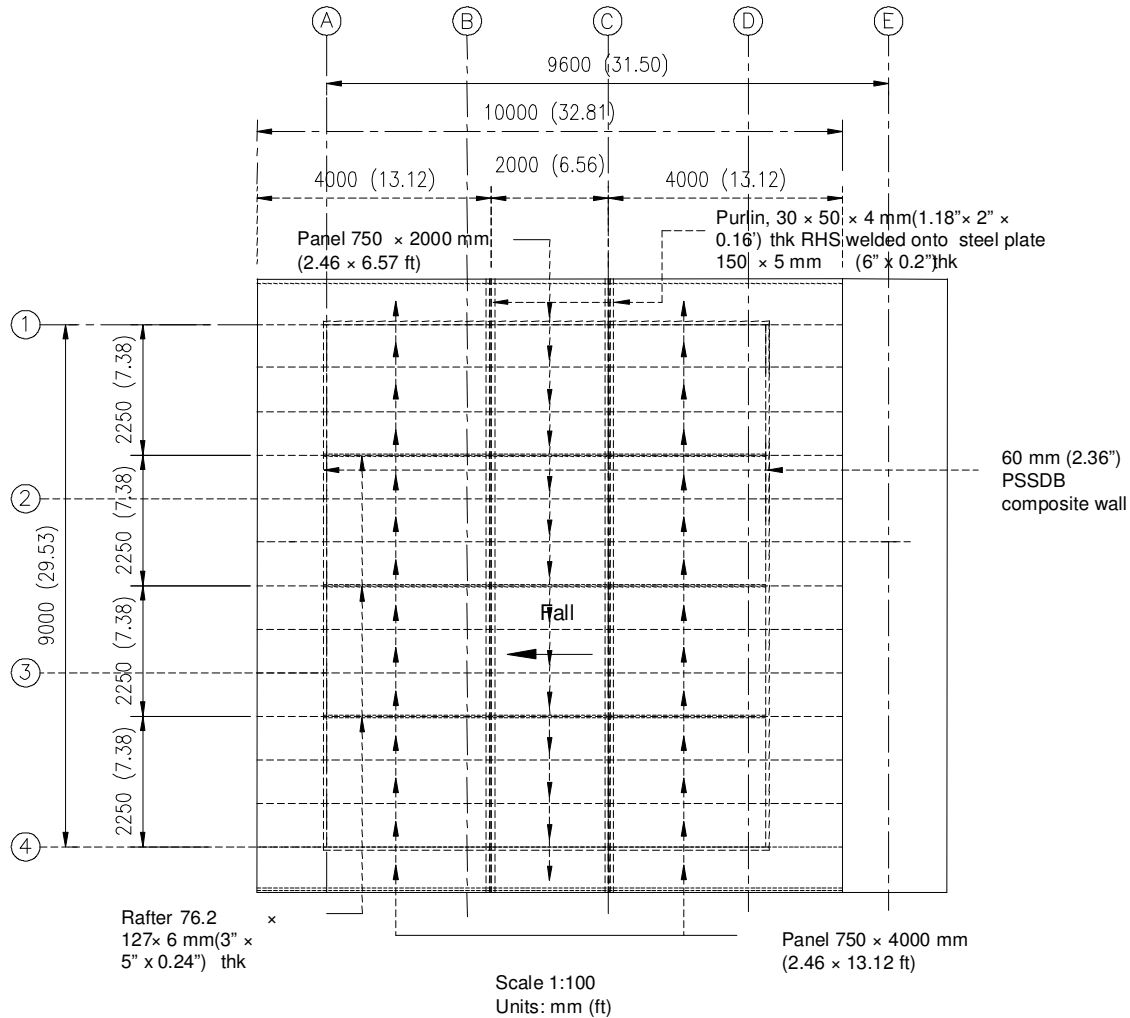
The arrangement of the PSSDB roof panels on a plan view.
